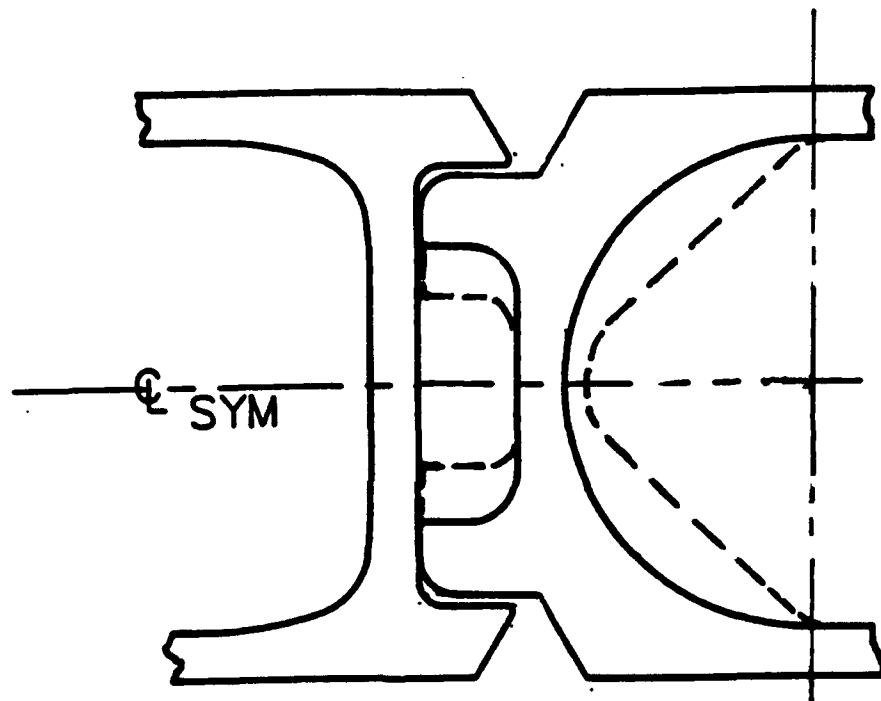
Suggested modification of Type III welded joint design (dashed lines).
